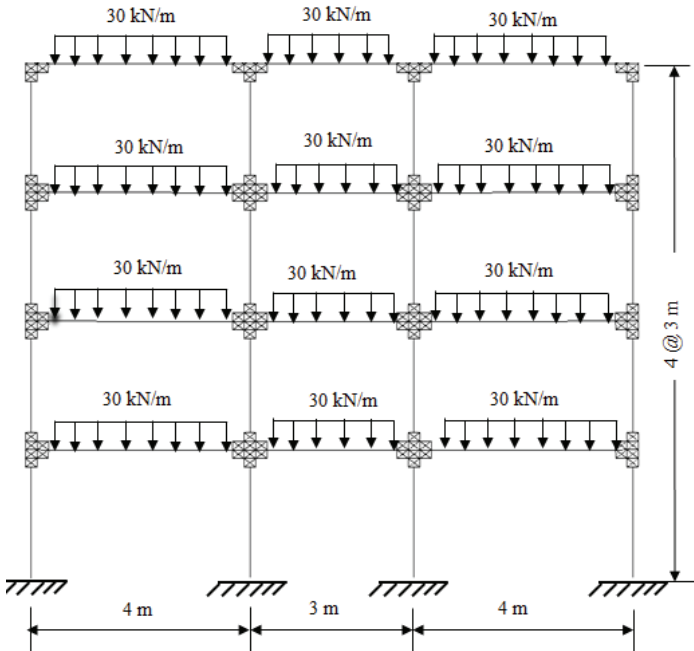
Structural analysis model of four-story frame with hybrid connections (H4)
